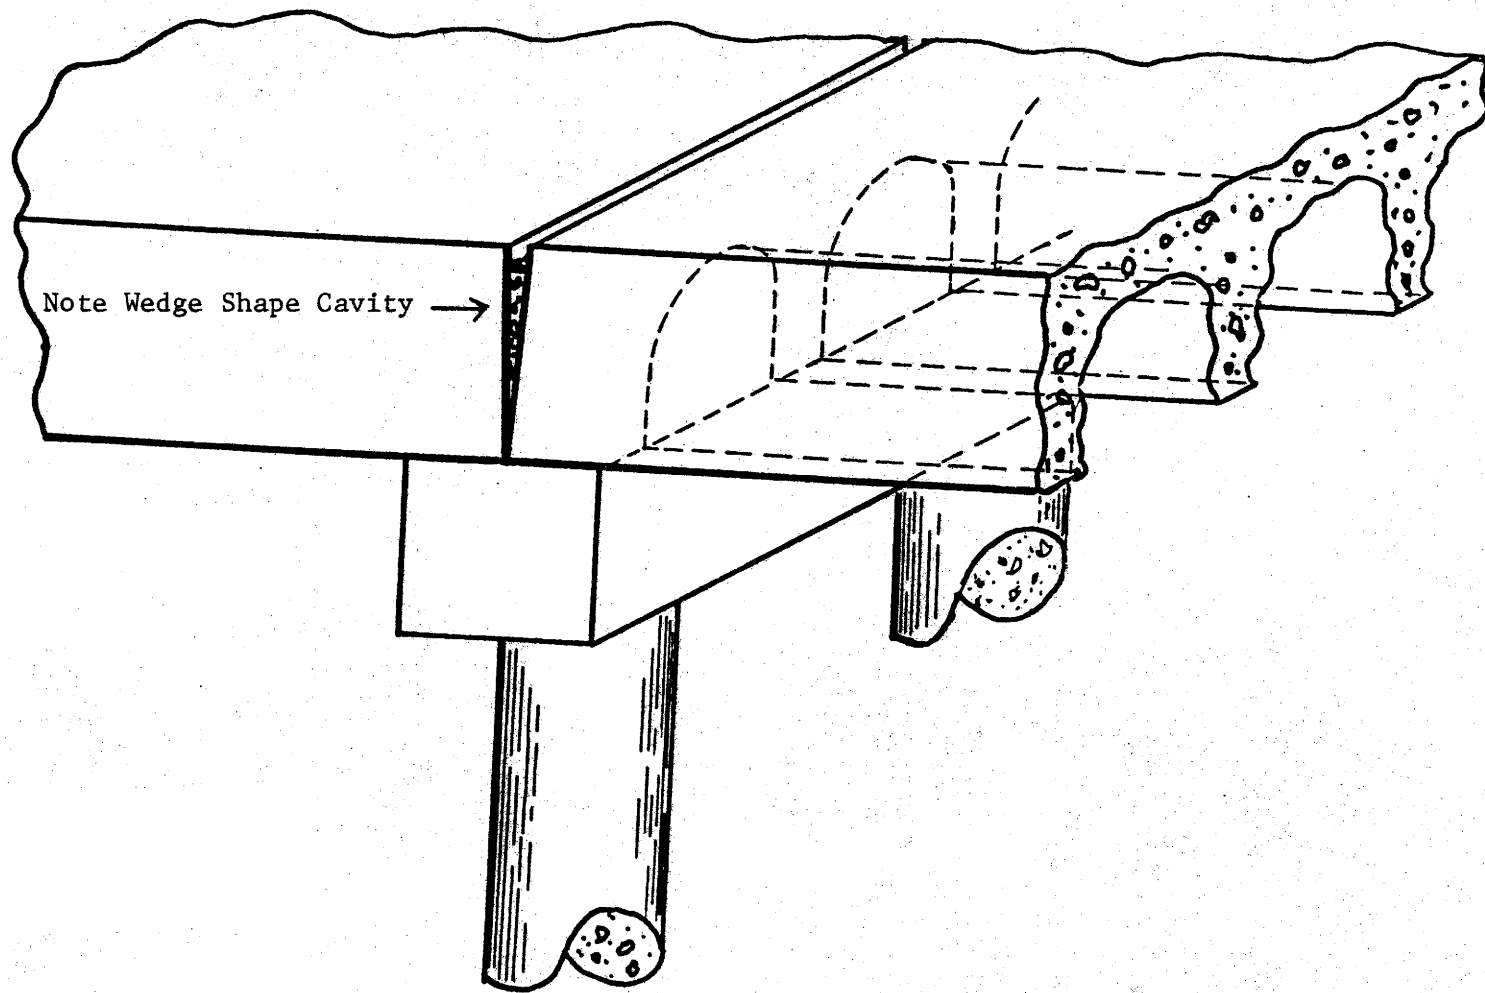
Fixed joints in pan-formed bridges are generally open about 1/4 inch at the top and completely closed at the bottom. Typically, adjacent spans are both doweled to the pier cap at these joints.
